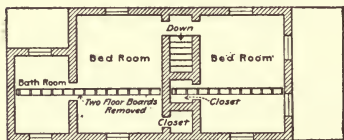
Second story plan of a house showing floor boards removed in one continuous line.
